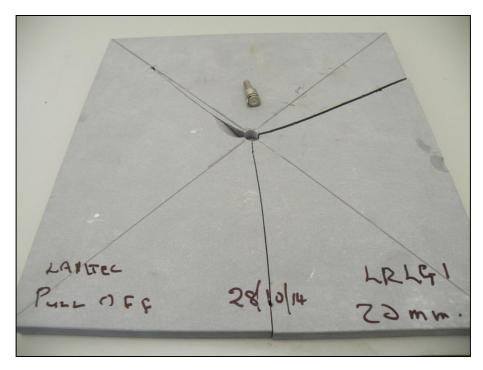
Showing failure on 20 mm thick panel (LRLG1) with 270 mm diameter ring specimen broke into 3 pieces.
